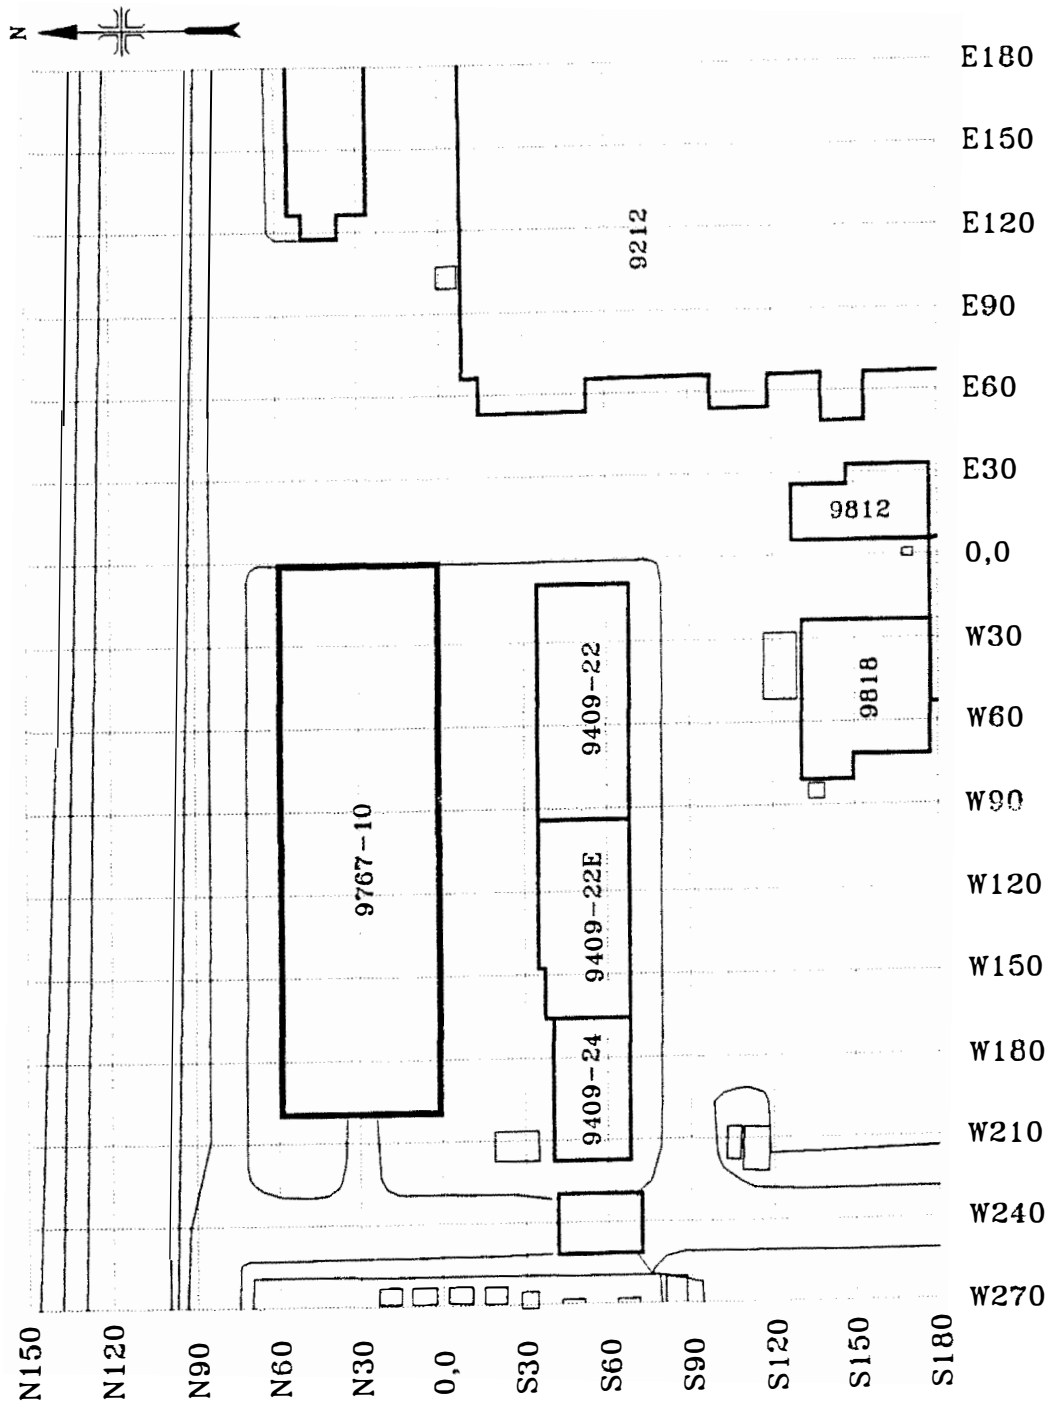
Area surrounding Building 9212 at the Oak Ridge Y-12 Plant Site.
